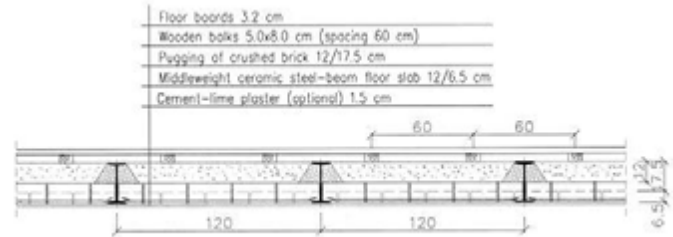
Cross section through the floor, perpendicular to the direction of steel beams
